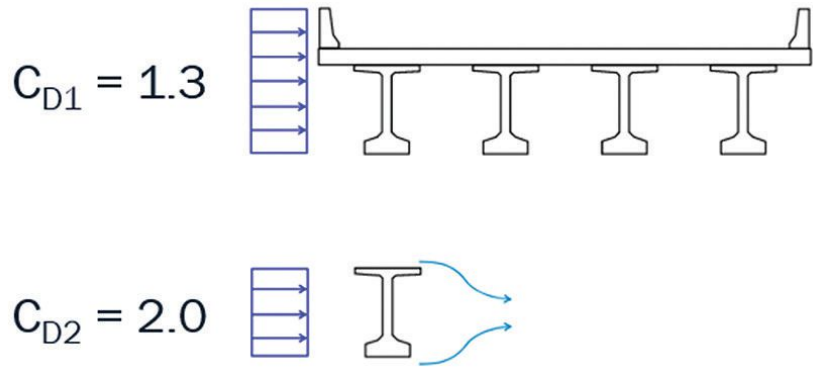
Due to airflow around the bare girder, the base drag coefficient  $C_D$  on a bare precast concrete girder is greater than on a completed bridge, even though the completed bridge has a larger area exposed to wind. Figure: Parsons.
